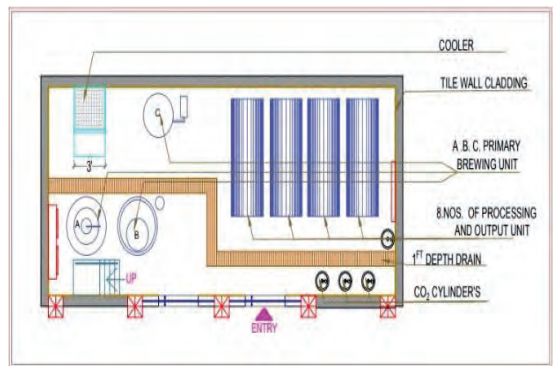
Auto Cad Drawing of the Brewing Facility Including Measurements
